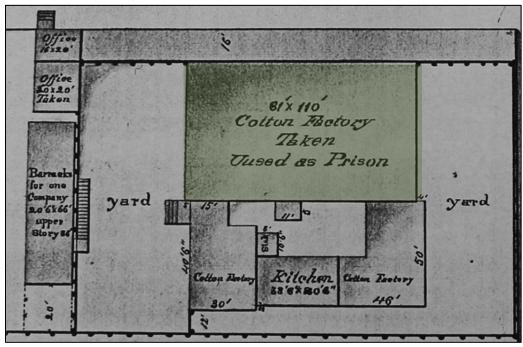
1865 Washington Street Military Prison, original footprint of building highlighted in green. Courtesy of Alexandria Local History Special Collections.
